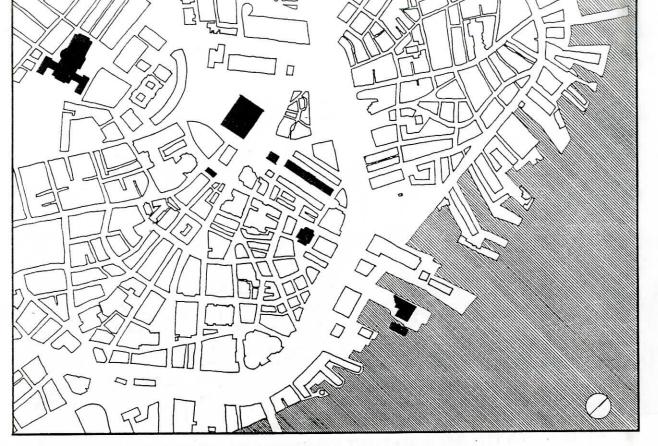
SITE PLAN SHOWING MAJOR PUBLIC BUILDINGS
